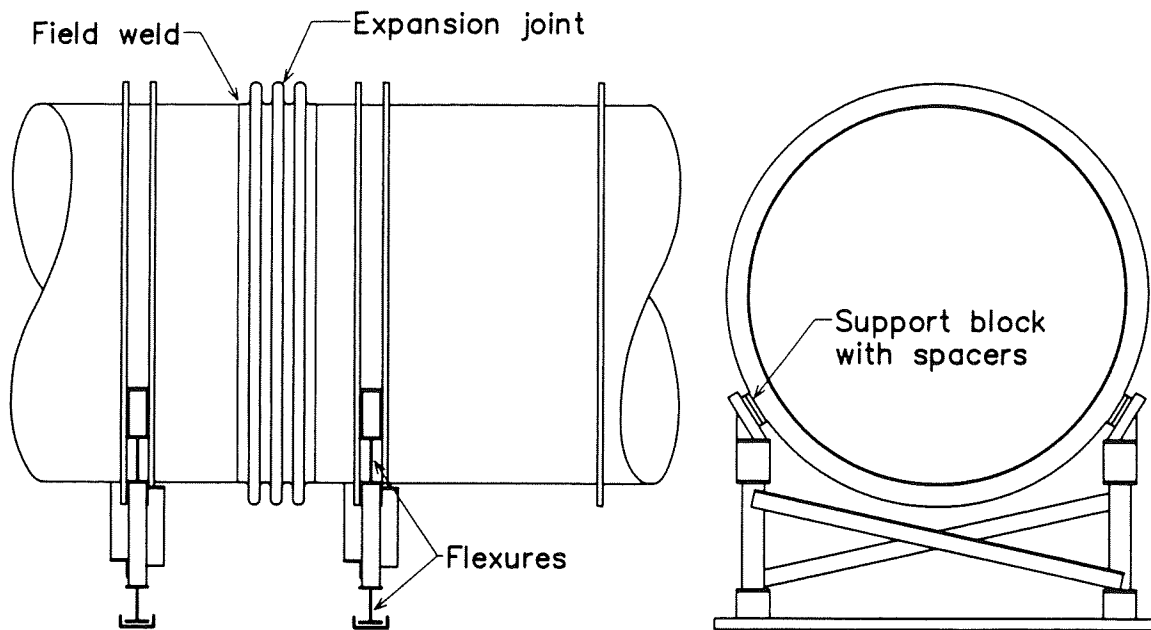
Sketch showing beam-tube supporting hardware. *Left:* The joint between tube sections. The two sections are butt-welded together in the field. Sections are supported by simple flexible supports that allow thermal expansion without slipping. *Right:* Cross-section of tube and supporting structure. The supports are made of roughly-cut pieces of standard carbon-steel structural members. These are welded together in a jig that defines the spatial relationship between the base-channel and support-block faces; all other dimensions are noncritical. The base-channel piece has two 6-in. slots to allow horizontal adjustment of the tube relative to the base. Vertical adjustment involves inserting spacers between the tube supports and tube sections.
